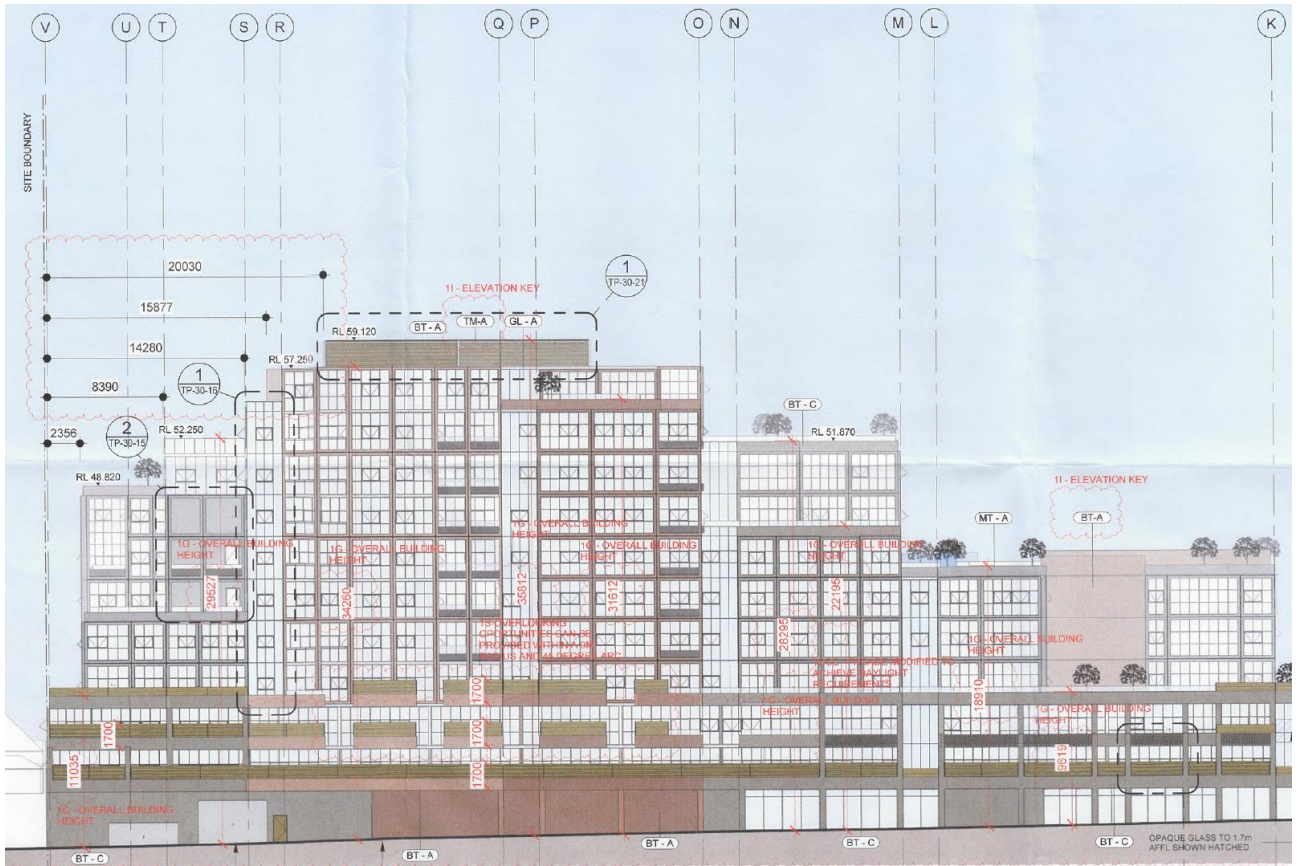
Approved laneway (east) elevation (Grid V to Grid K)
